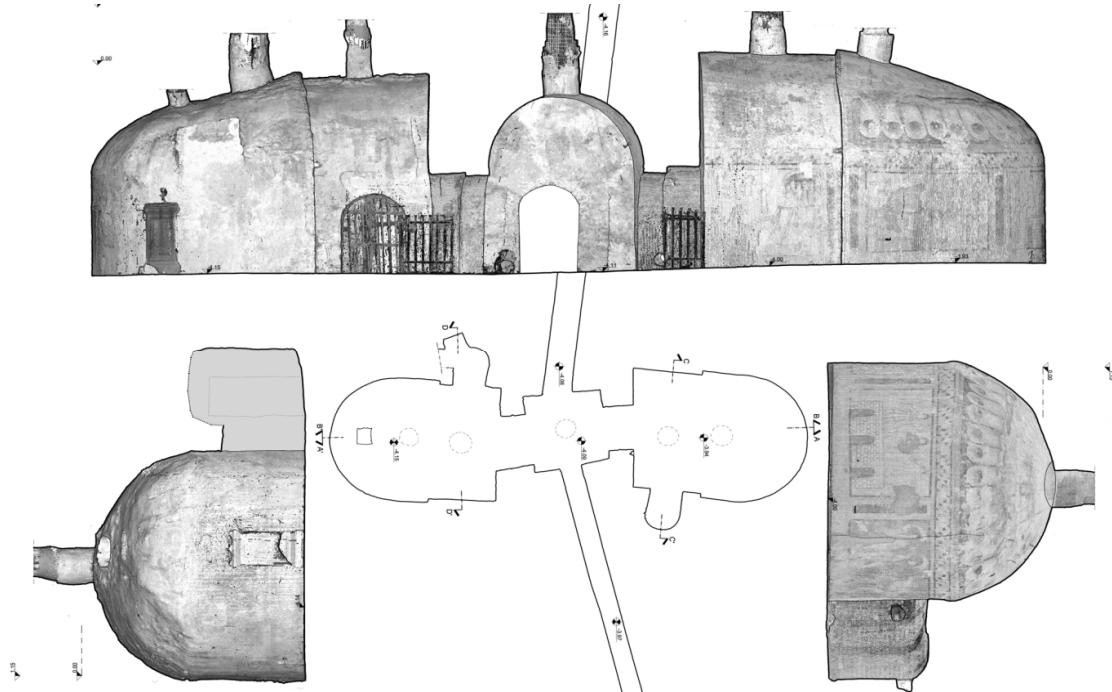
Plan view and elevations rendered with point cloud image in gray scale.
